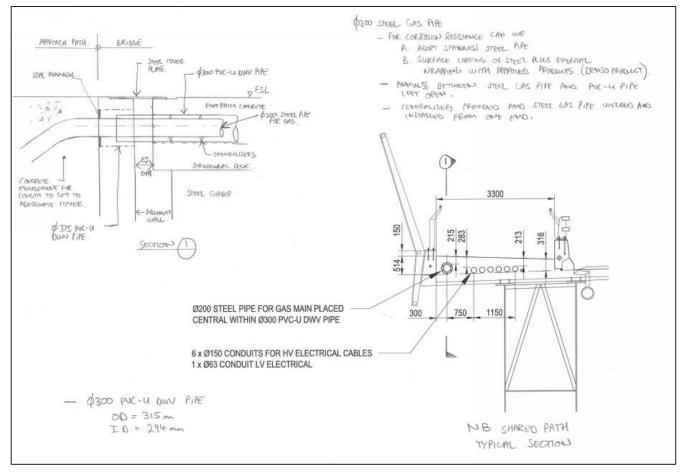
Jacobs' proposed gas main design solution under the bridge
